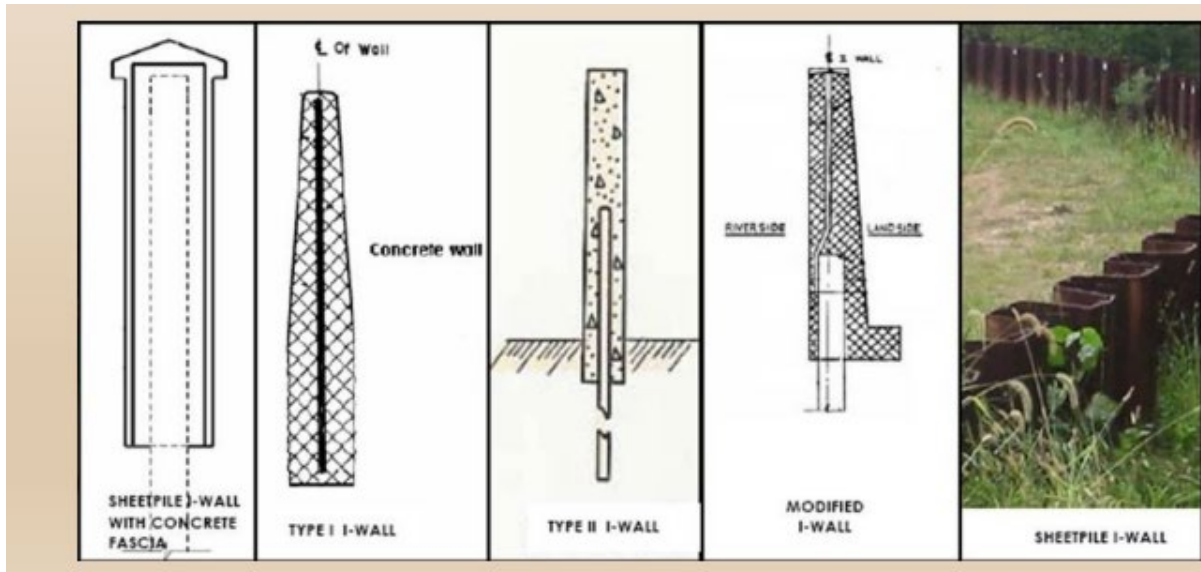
Typical "I wall" floodwalls (embedded portion not shown)
